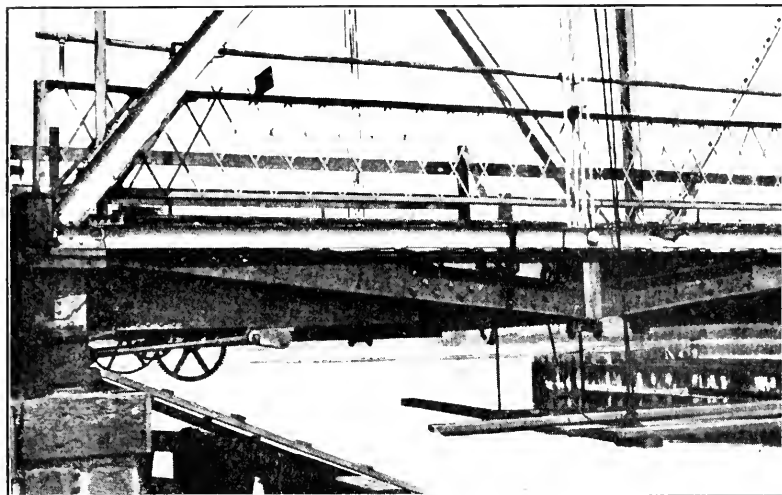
TEMPORARY CHORD IN PLACE AT WEST END OF SOUTH TRUSS.
